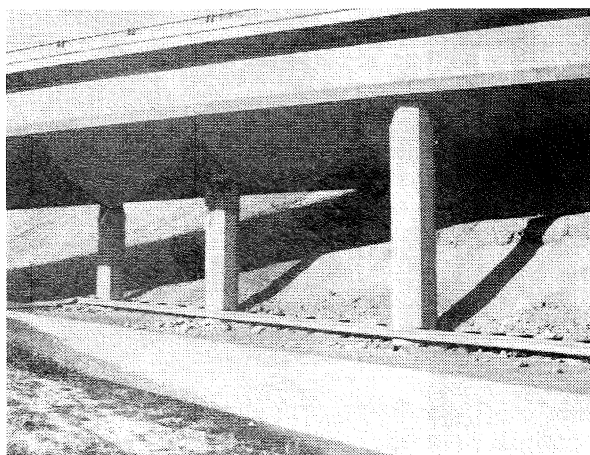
Bending failures in the columns of the eastern pier of the Northbound Truck Route Undercrossing. The columns are on spread footings.
